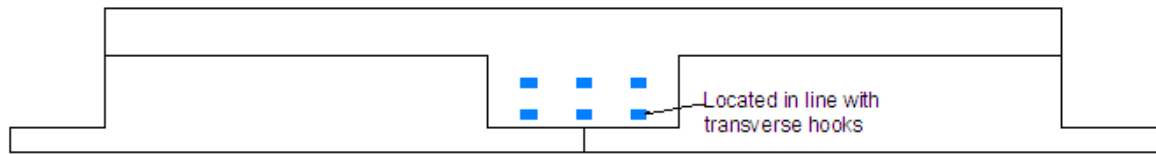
Instrumentation layout for the Concept 2 laboratory bridge specimen
